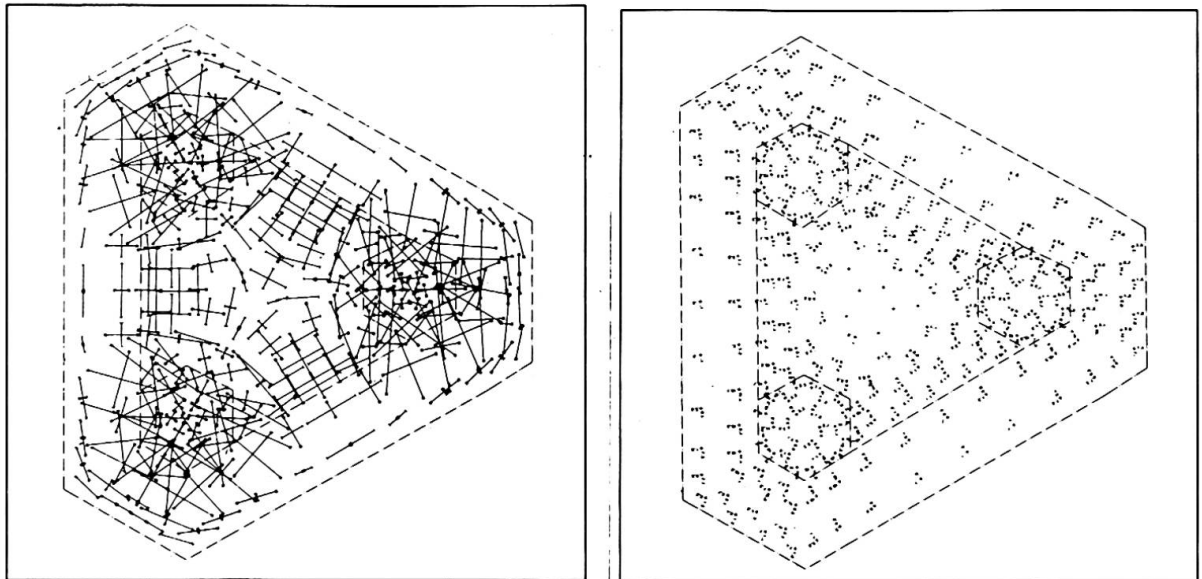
Principal moments and reinforcement dimensions for a reinforced concrete offshore platform.
